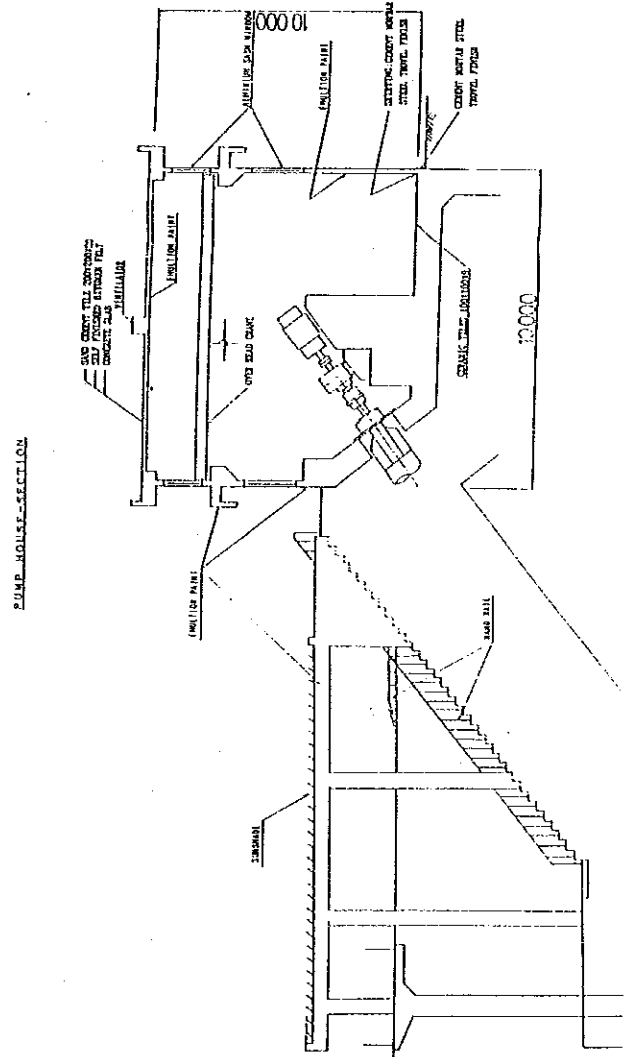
PLAN OF SEWER TRANSFER PUMP STATION NO.5 (B)
